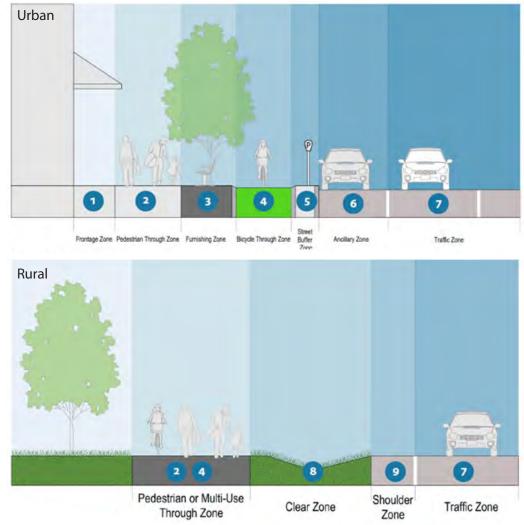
URBAN STREET AND RURAL ROAD ZONES
